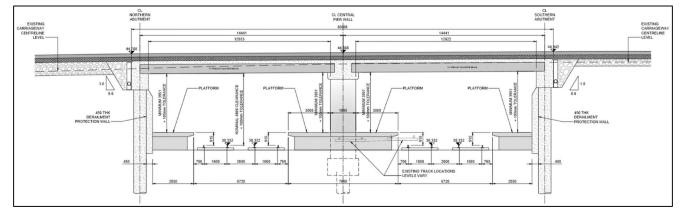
Typical 2-span bride section (Potential future platforms shown indicatively)
